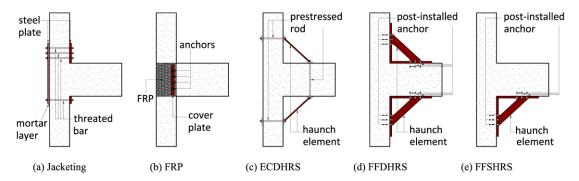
Schematic diagrams of various retrofit techniques for external RC beam-column joint: (a) Steel jacketing; (b) Fibre-reinforced polymer; (c) Externally clamped double haunch retrofitting system; (d) Fully fastened double haunch retrofitting system; (e) Fully fastened single haunch retrofitting system.
